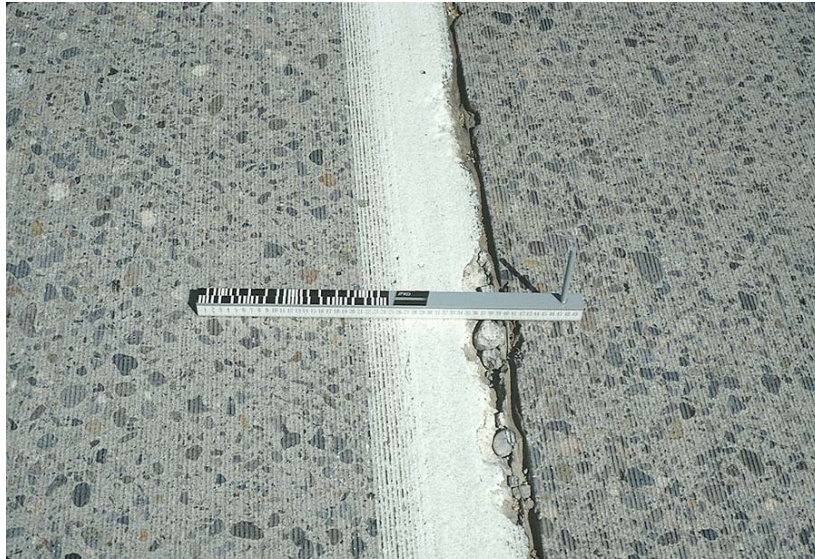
Low Severity Spalling of Longitudinal Joint
